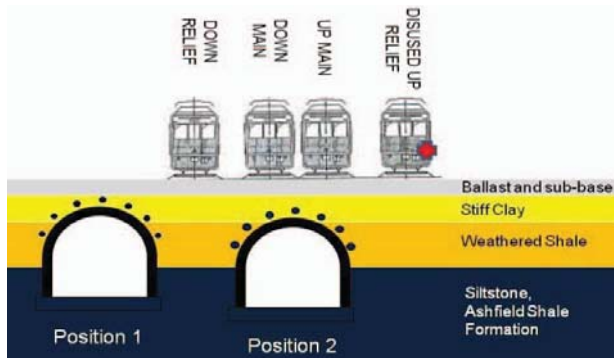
Schematic cross-section of tunnel and railway tracks, 3.5 m maximum ground cover. Tunnel traverses the tracks on a skew.
